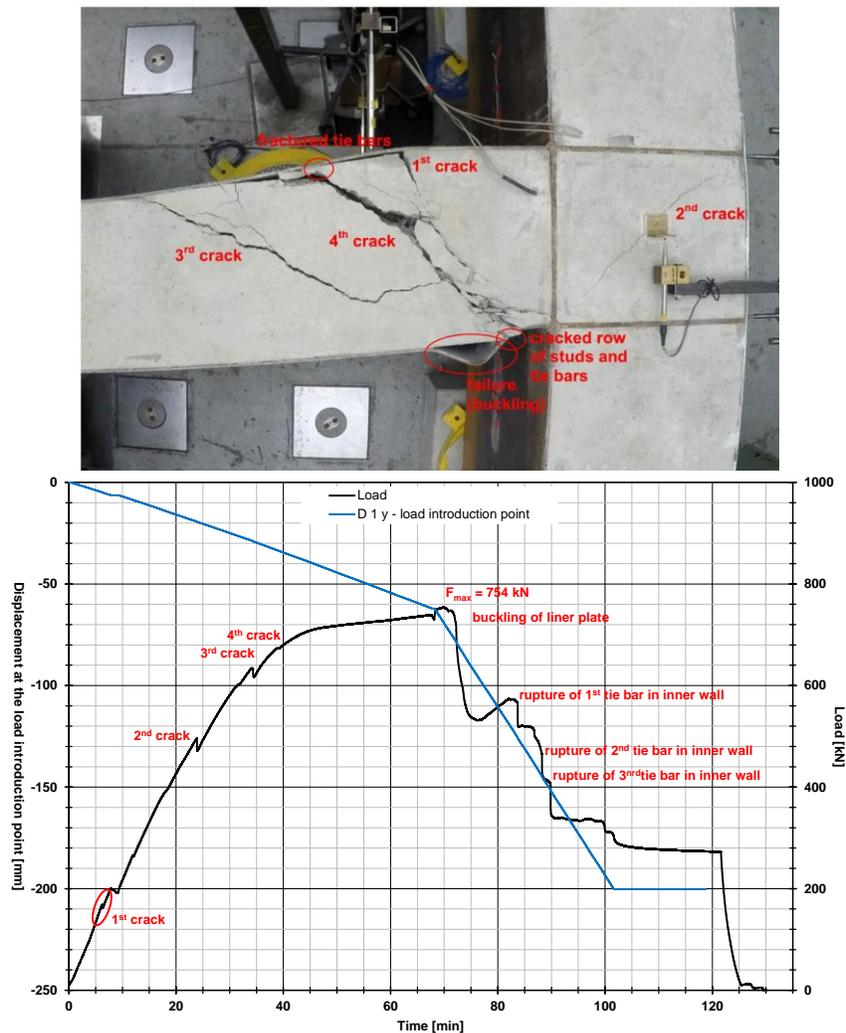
Wall to wall type II in bending loading at the end of the test (top) and loading curve (bottom)
